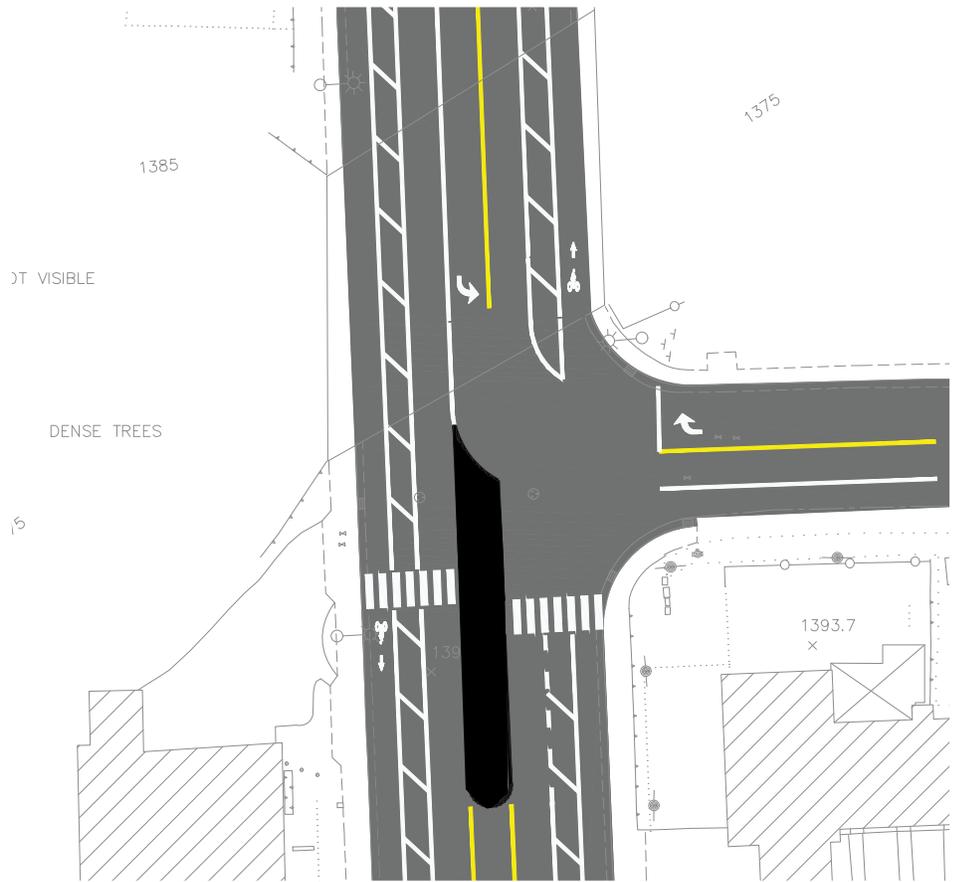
Conceptual Plan of Main Street and North Bechtel Intersection
